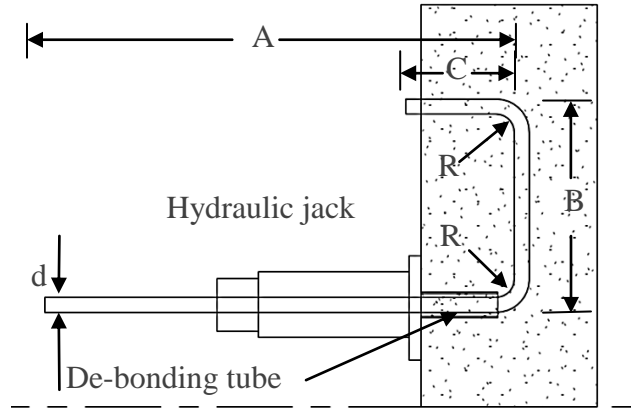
Details of test specimen according to JSCE-97 E-531 test method
